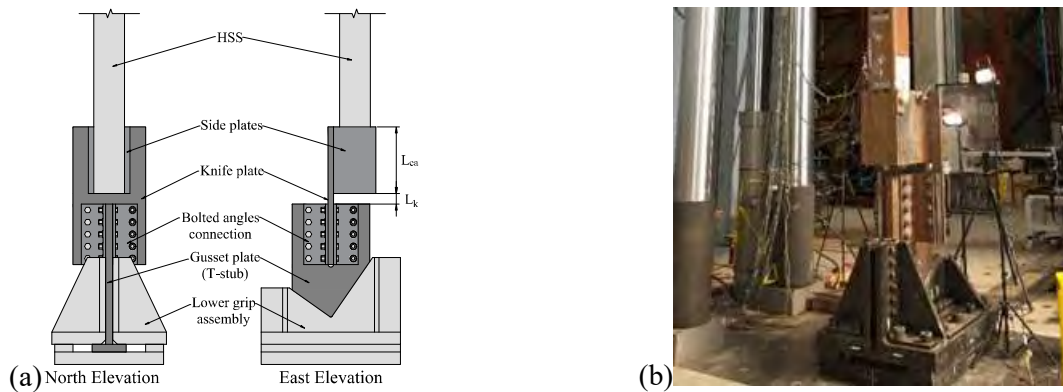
Detail of Specimen 5 and T-stub attached to lower grip assembly: drawing (a) and photograph (b)
